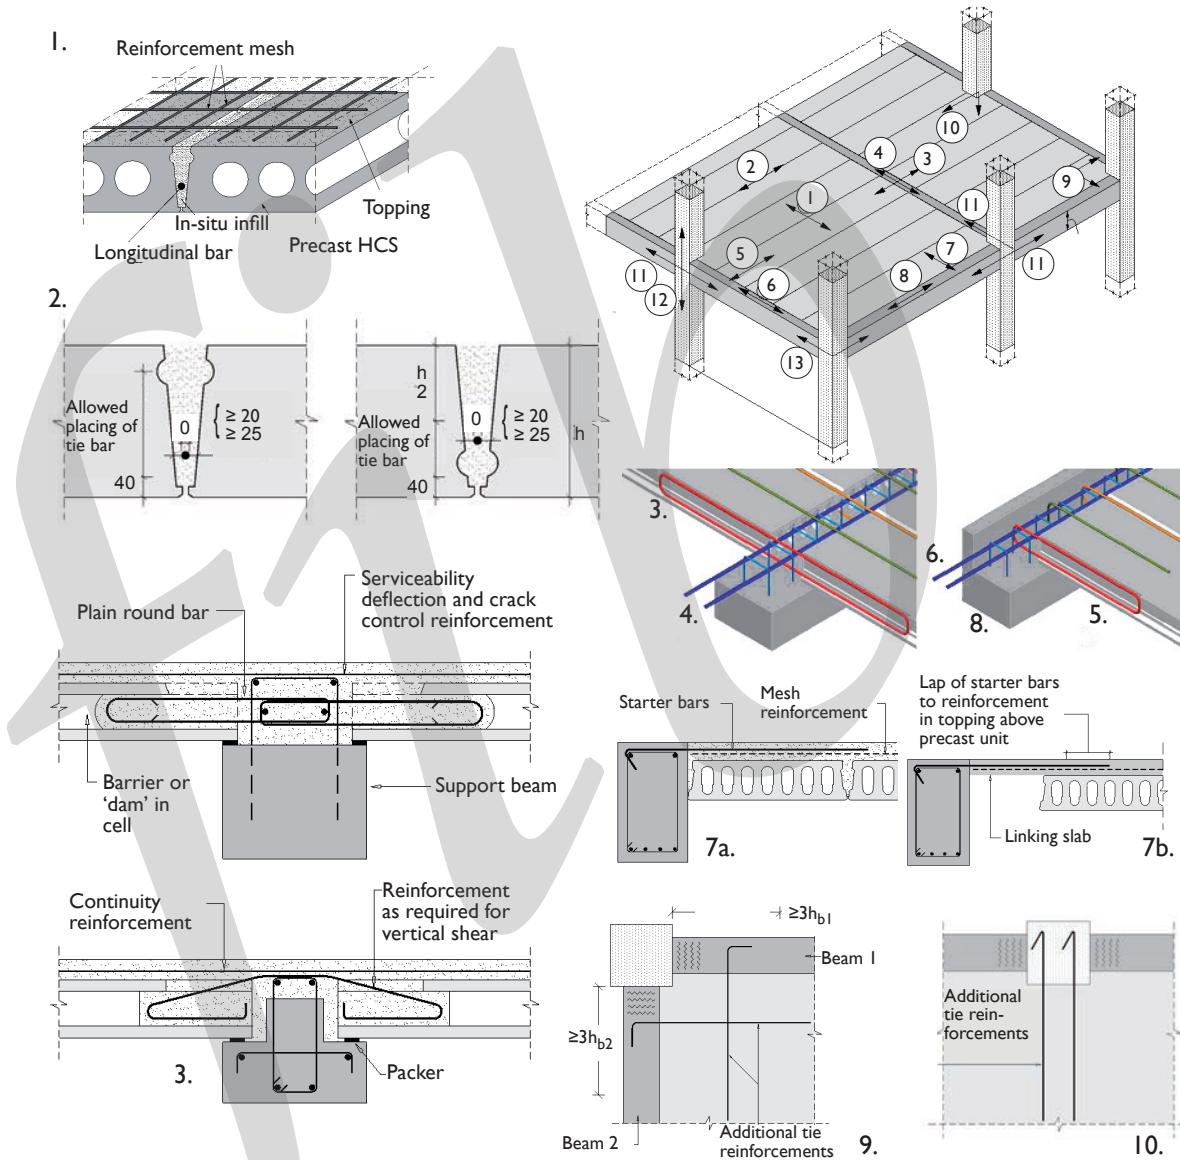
Location and types of ties in precast skeletal structures in which the floor contains prestressed hollow-core slabs
